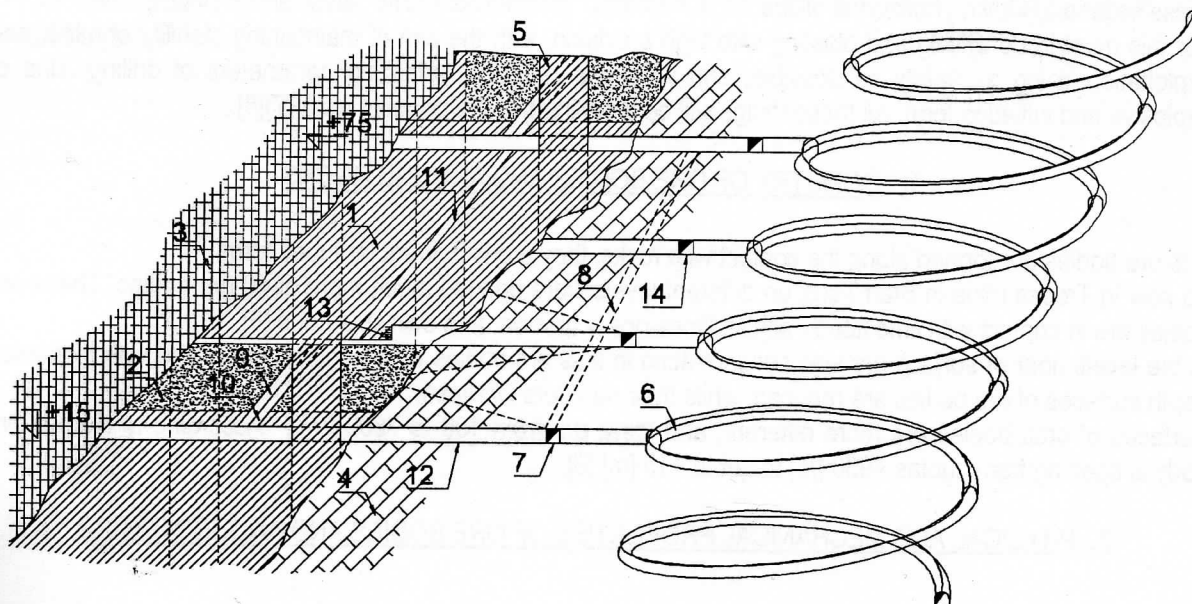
Exploitation with horizontal cutting, from down to up, and with hydro filling, in the workshop 140th in the level Xth: 1 – Ore body, 2 – Hydro filling, 3 – Hanging wall, 4 – Footwall, 5 – Pillar, 6 – Spiral, 7 – Hauling drift, 8 – Field raise, 9 – Raise for people, 10 – Raise for material, 11 – Air raise and for hydro filling, opened across ore body, 12 – Main drift, 13 – The block in exploitation and 14 – Longitudinal drift on the floor of the ore body.
